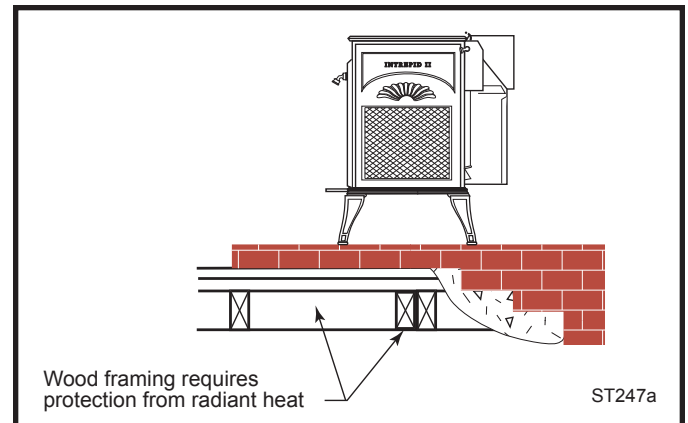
Supporting timbers under fireplace hearth are considered to be combustible.
